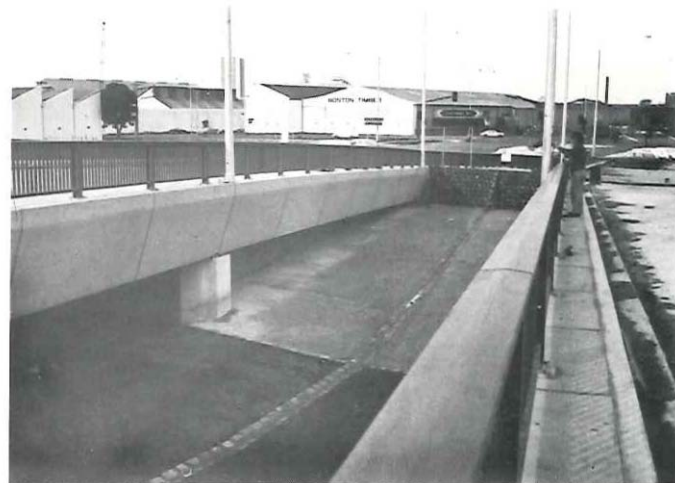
Substantially completed Johnson Street Bridge showing fascia panels
